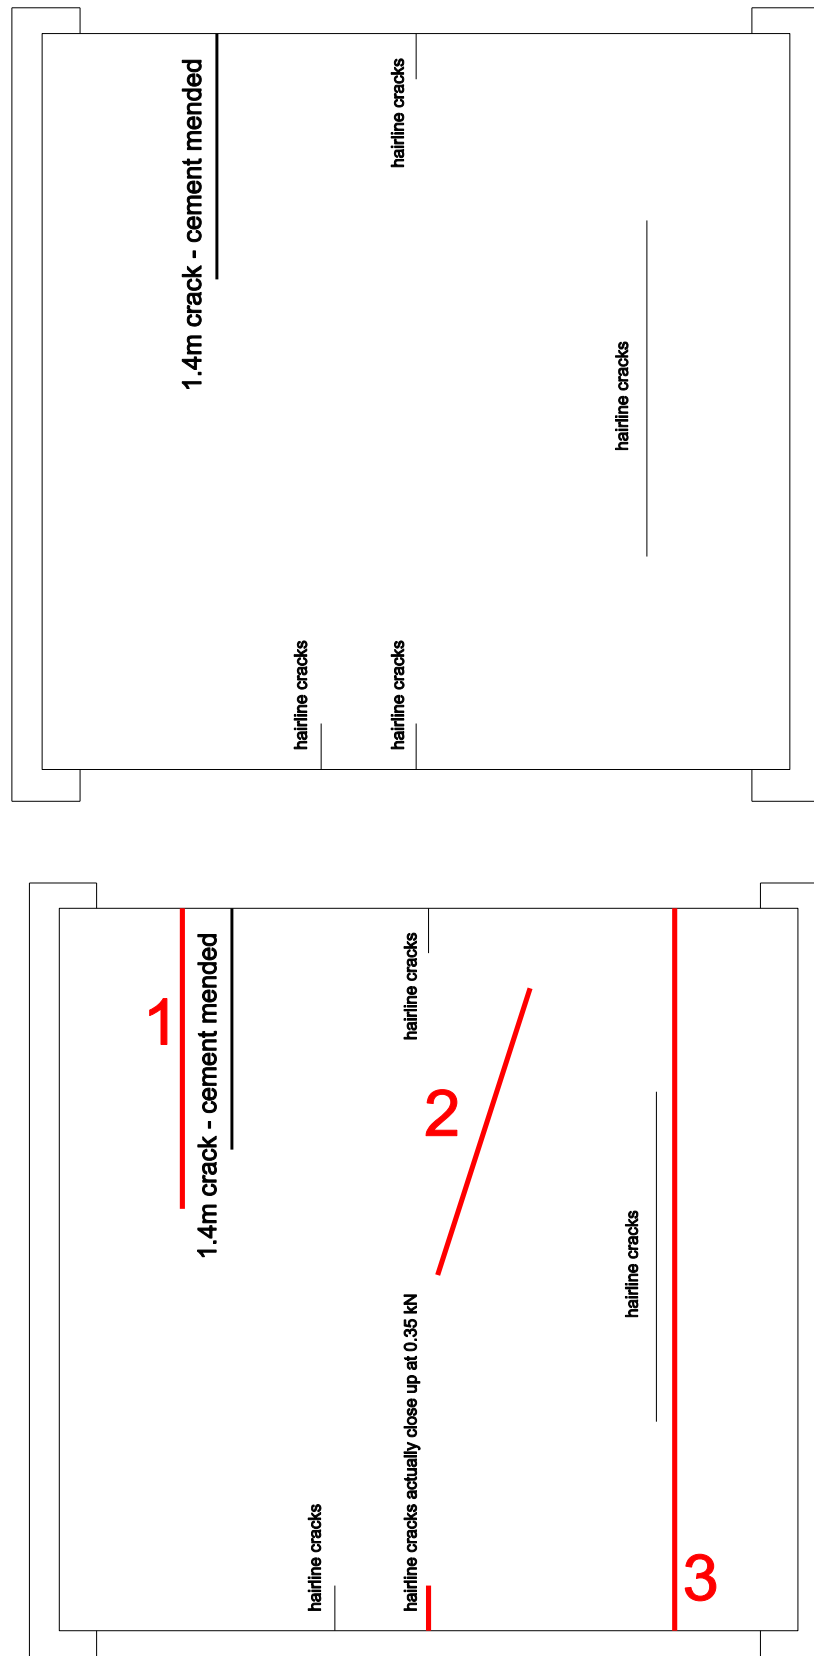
top: Locations of cracks (on external surface) before load test
